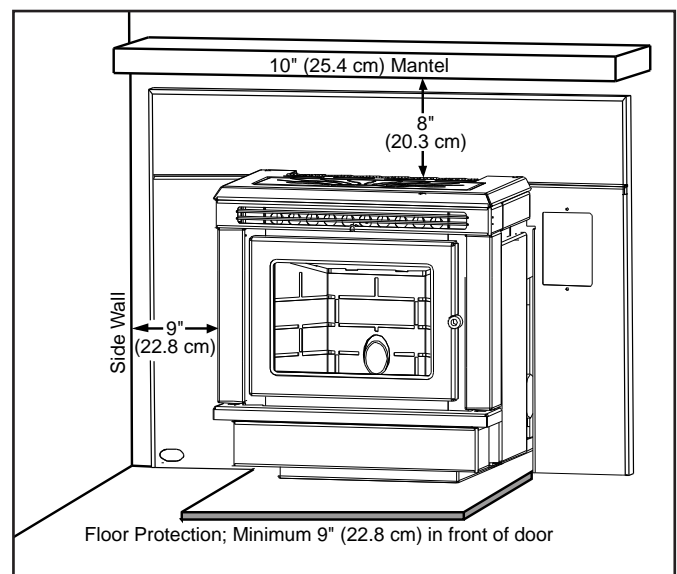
EF2-1 FPI Clearance to Combustibles.
